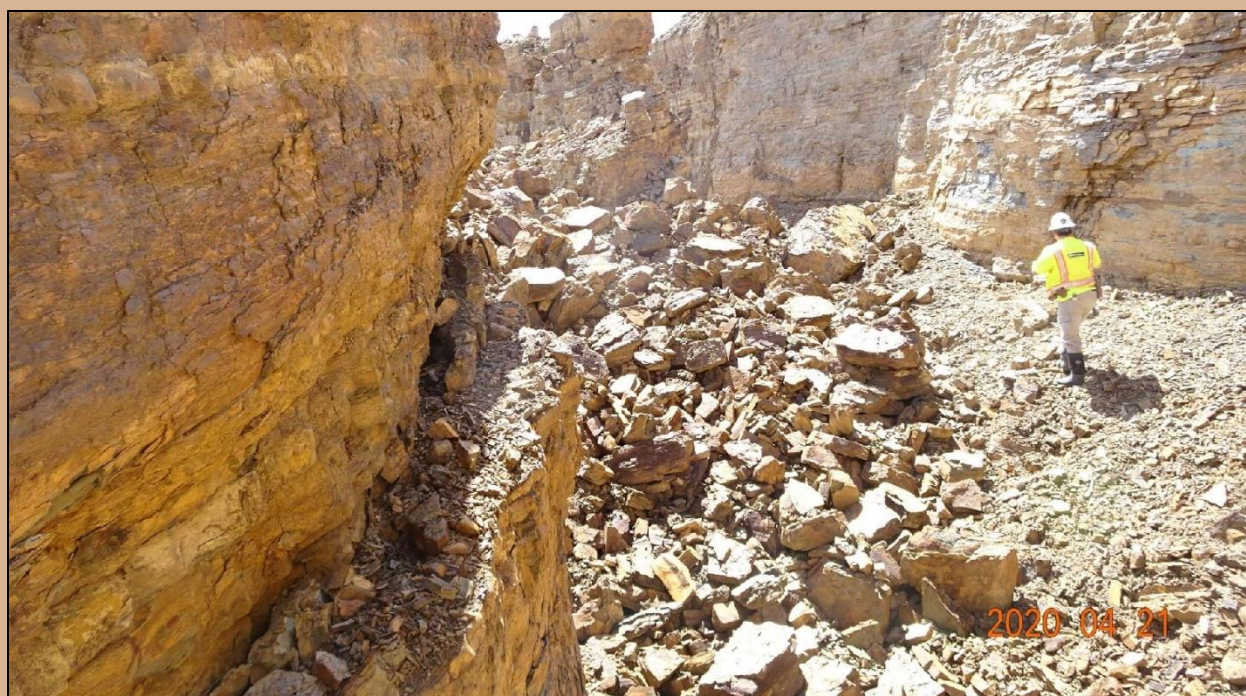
A worker walks through one of the cracks between a slump block and bedrock at Cut 29.
